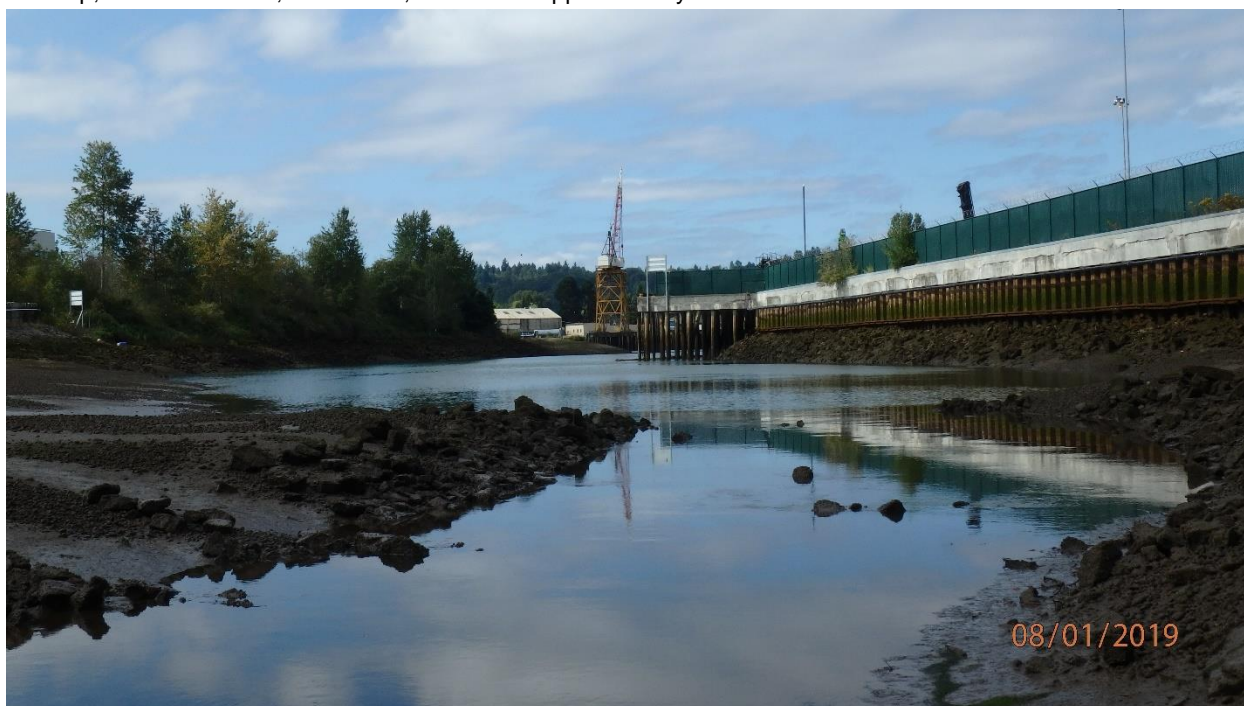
Vantage from photo station G looking southwest toward the south slough; Azimuth 200° M; 10:15 PDT, water level approximately -1.24 ft MLLW
